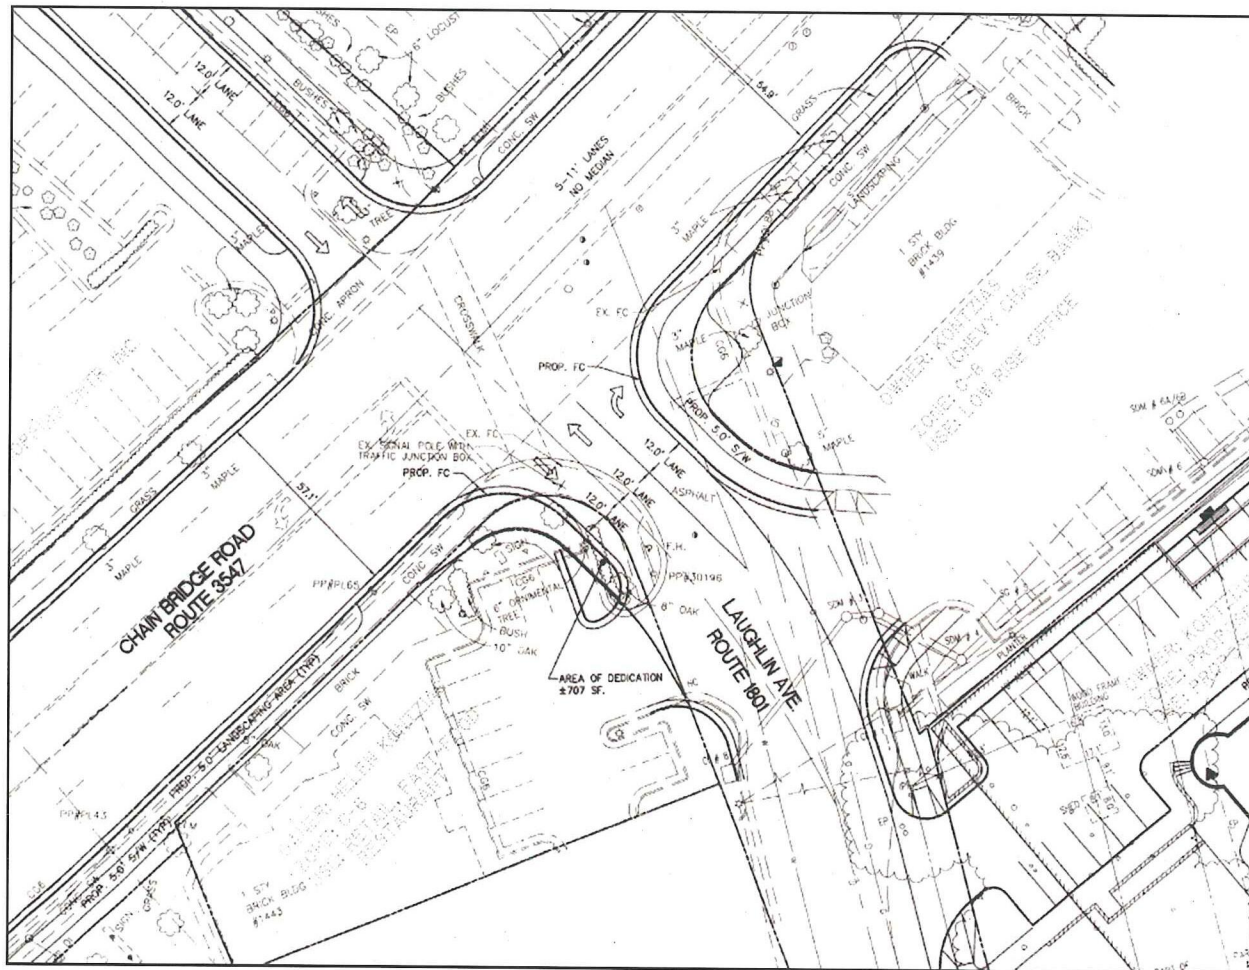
The above intersection relocation plan shows how Laughlin Avenue was narrowed and realigned to a more direct, perpendicular intersection with Chain Bridge Road. (Source – Fairfax County DPWES)
